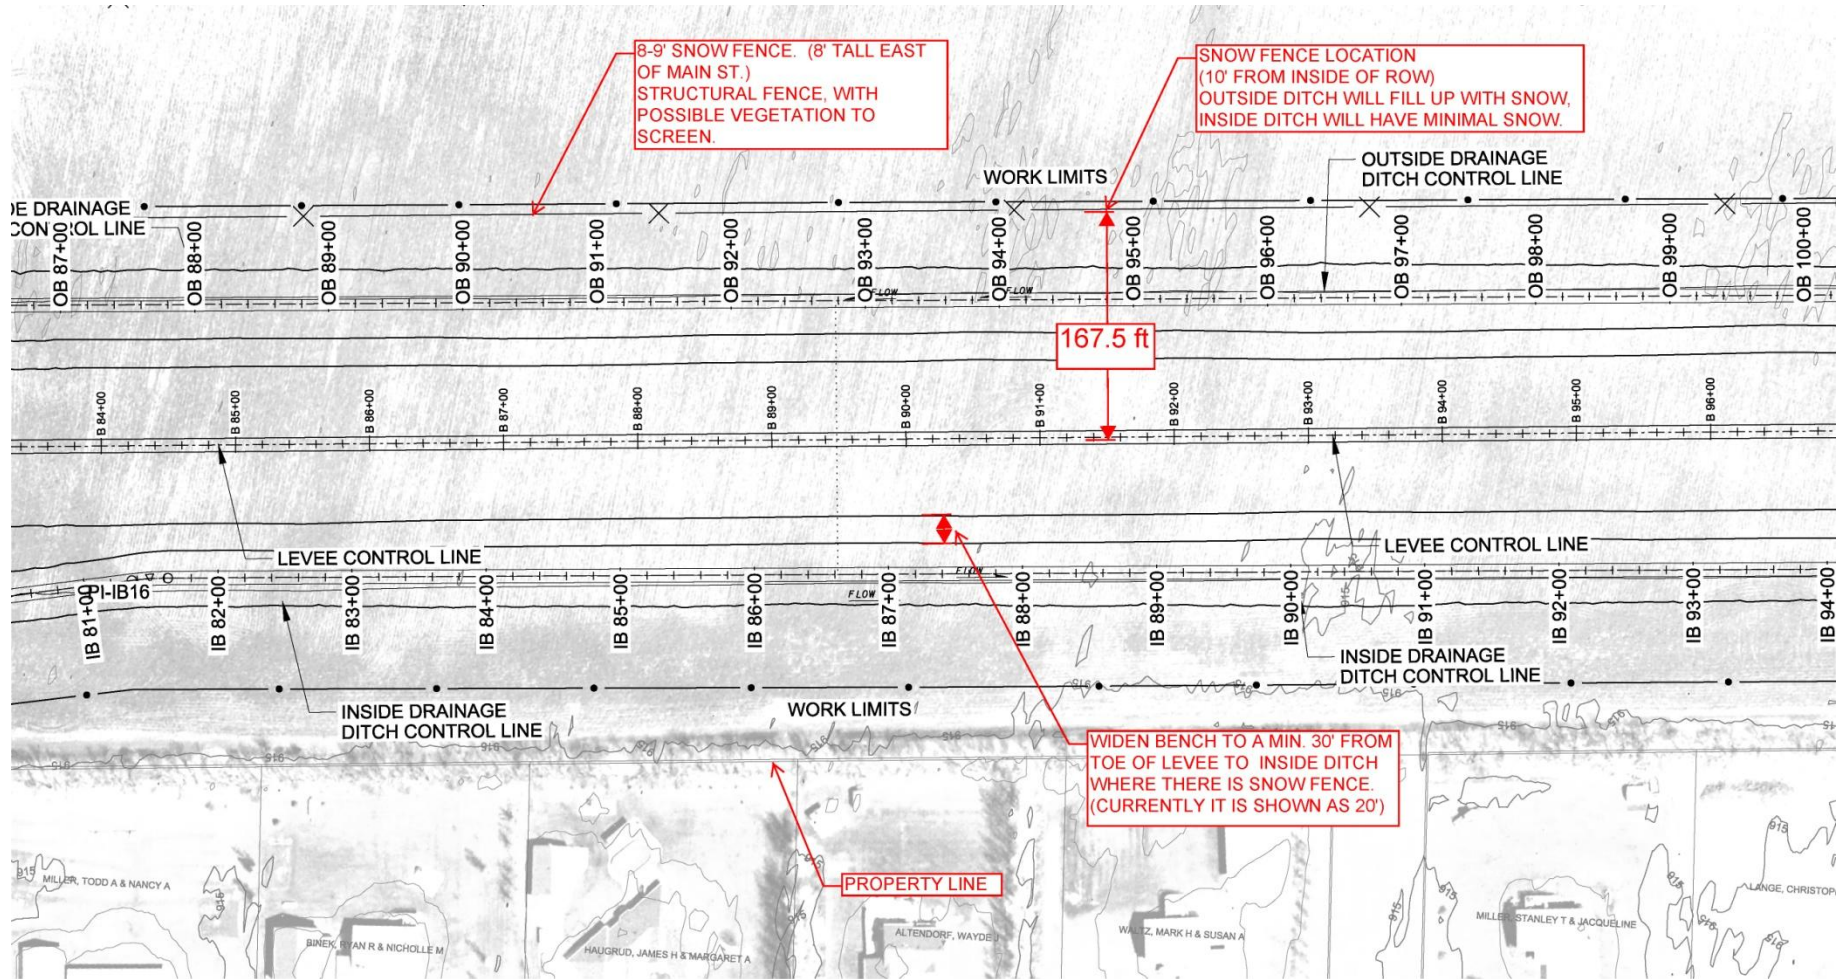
DETAILED PLAN VIEW OF SNOW FENCE
